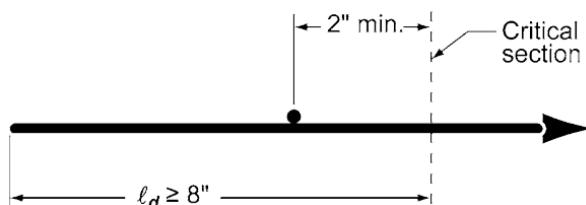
Development of Deformed Welded Wire Reinforcement (adapted from ACI 318-14, courtesy of ACI)
